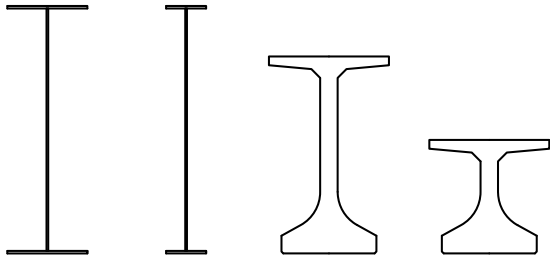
Examples of I-shaped girders (steel plate girders and Florida-I Beams) for which $C_p = 2.2$ (per FDOT, 2012e)
